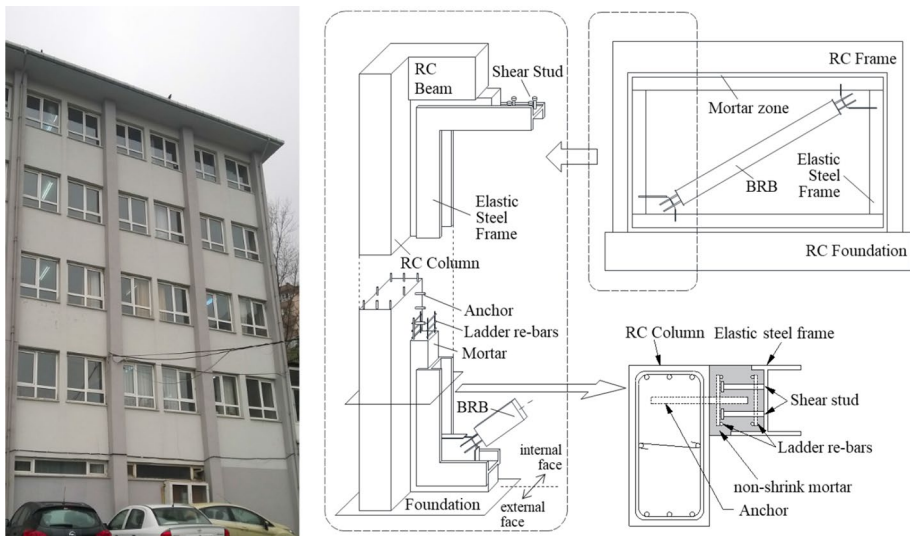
Typical school building in Turkey (left) retrofit concept and RC to steel frame connection layout (right)
